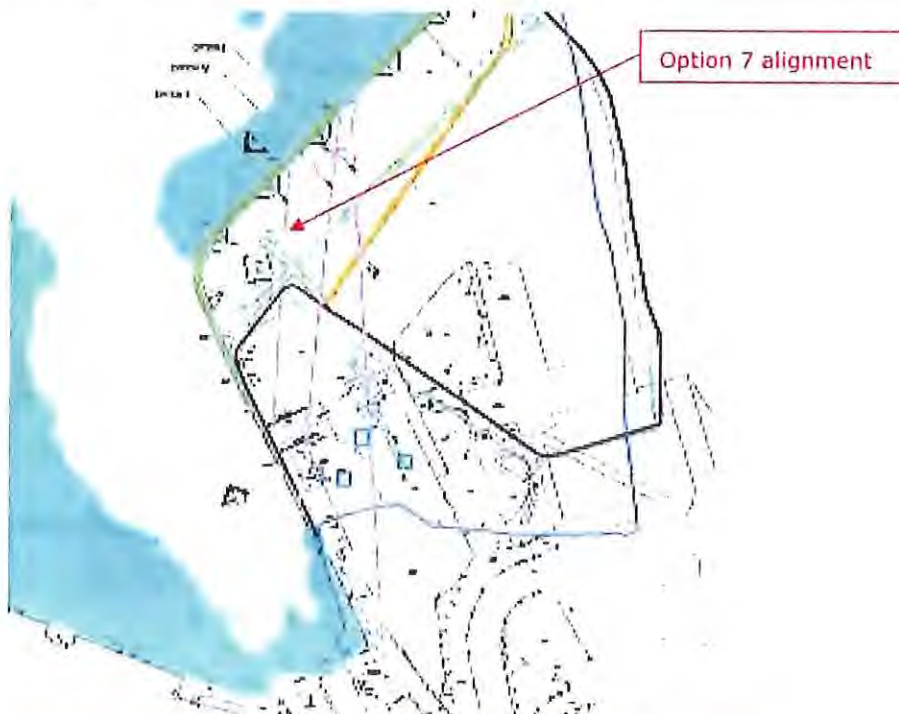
Extract from buried structure plan - refer to Appendix 2 for full detail
